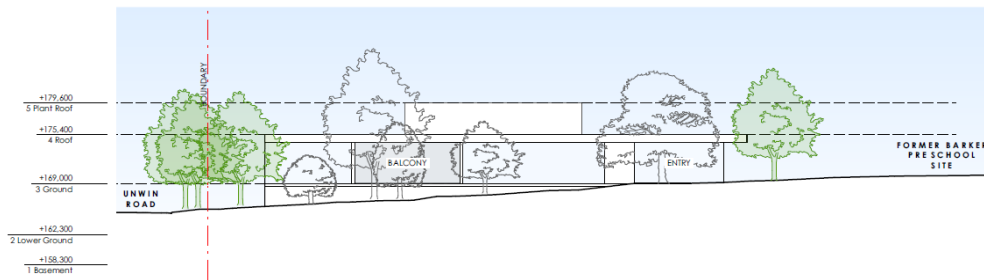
Proposed north elevation for the new Co-Curricular Performing Arts and Exam Centre building, looking south from Clarke Road. flag. (Source: Neeson Murcutt + Neille)
